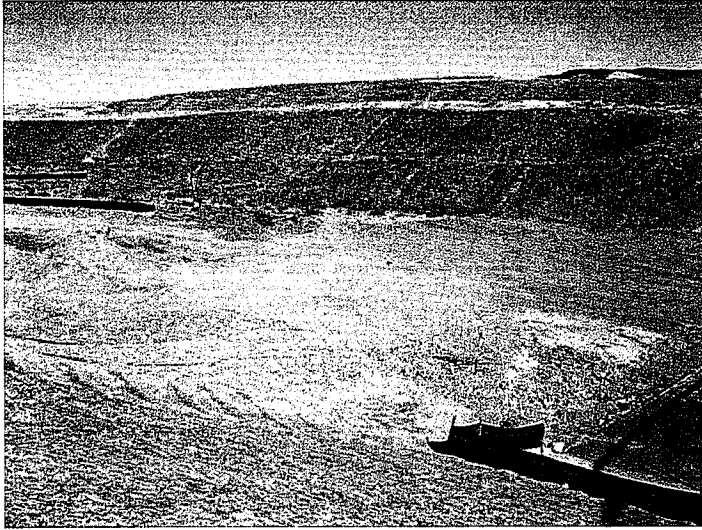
Unstabilized dirt in the channel downstream of the Loop Road bridge.
